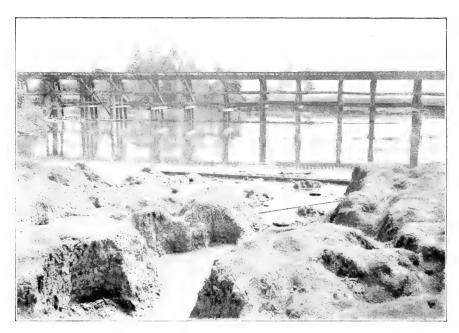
Washout at Summers ditch crossing, Big Four railroad, Evansville to Mt. Carmel division.
